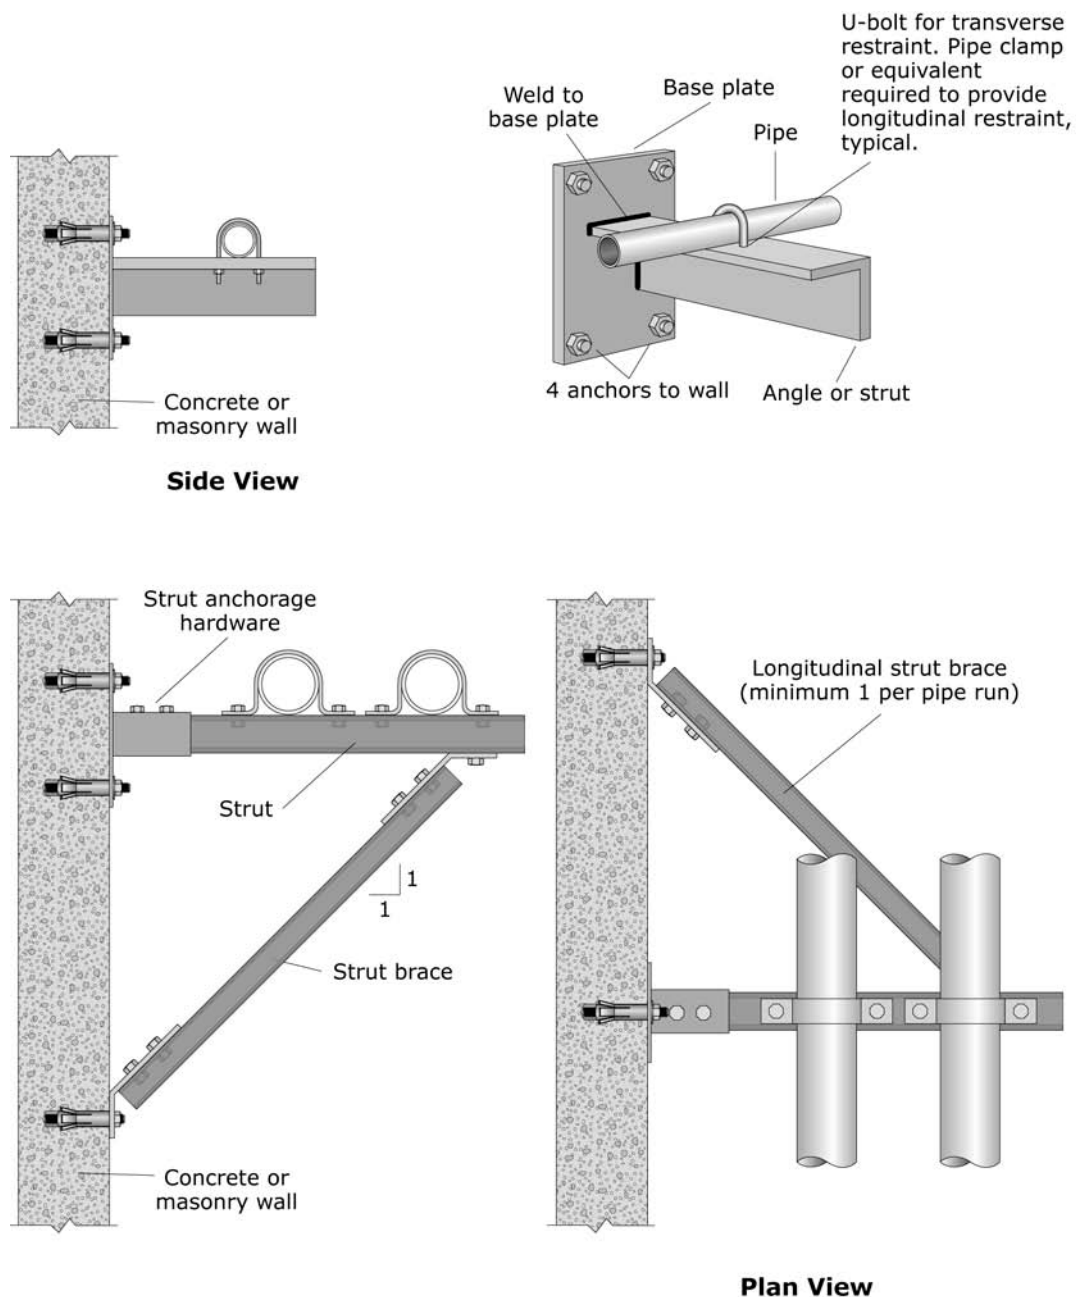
Wall-mount with steel shape or struts welded to concrete wall (ER).
